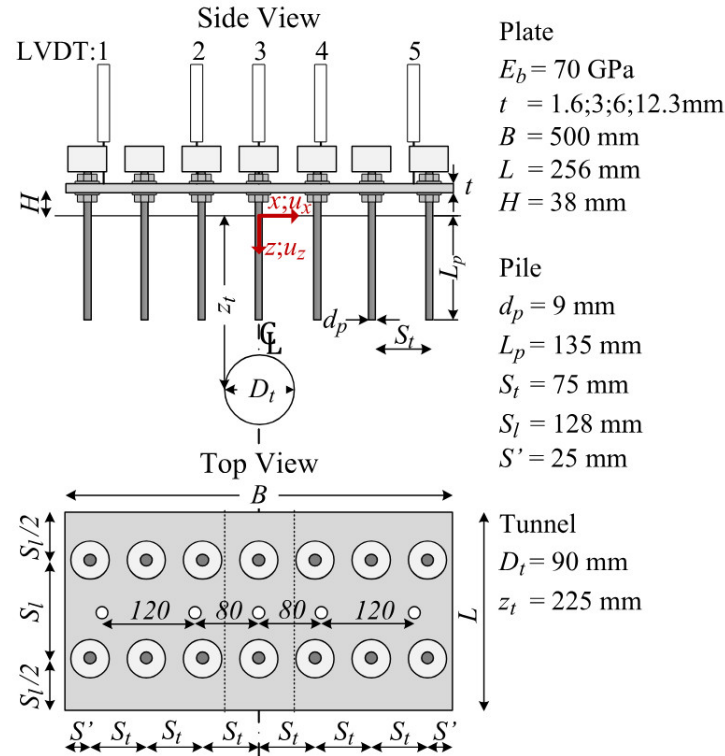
Test layout (in model scale) of tunnelling beneath piled plate (Franza and Marshall, 2018)
